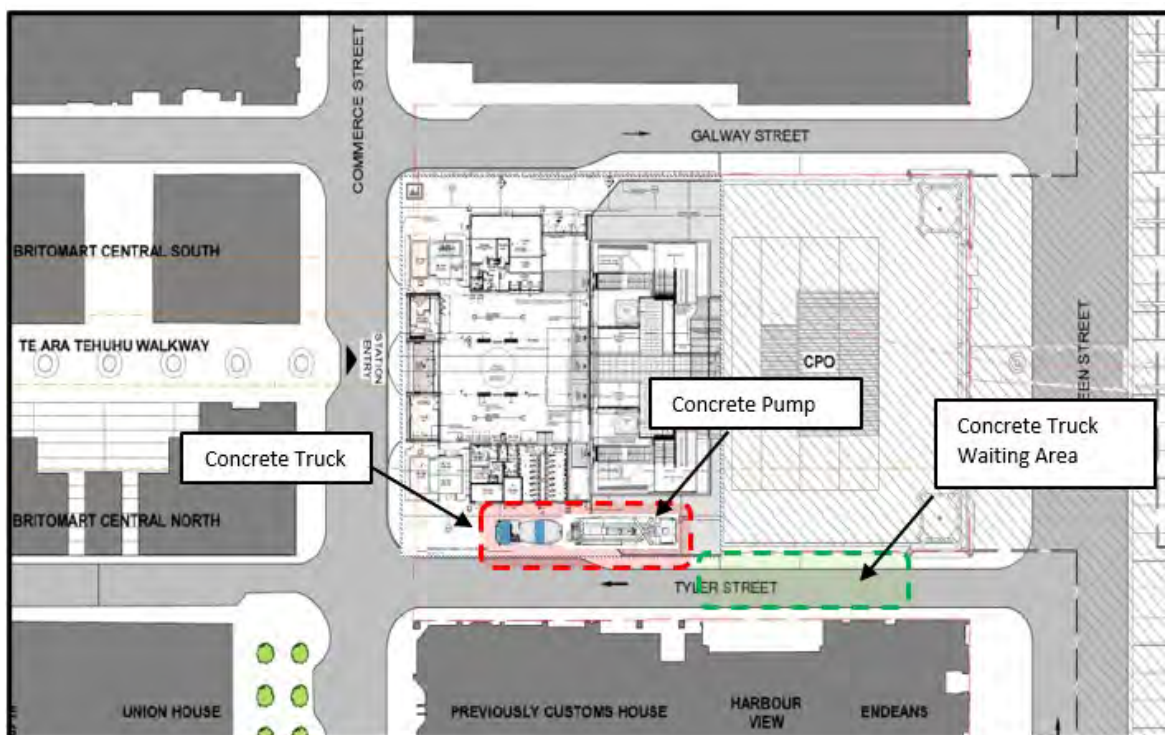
Proposed Concrete Truck/Pump Location and Arrangement at the SPA
